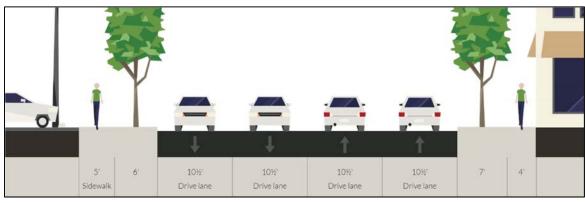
William Street Cross Section between Ashley St and Main St - Existing
